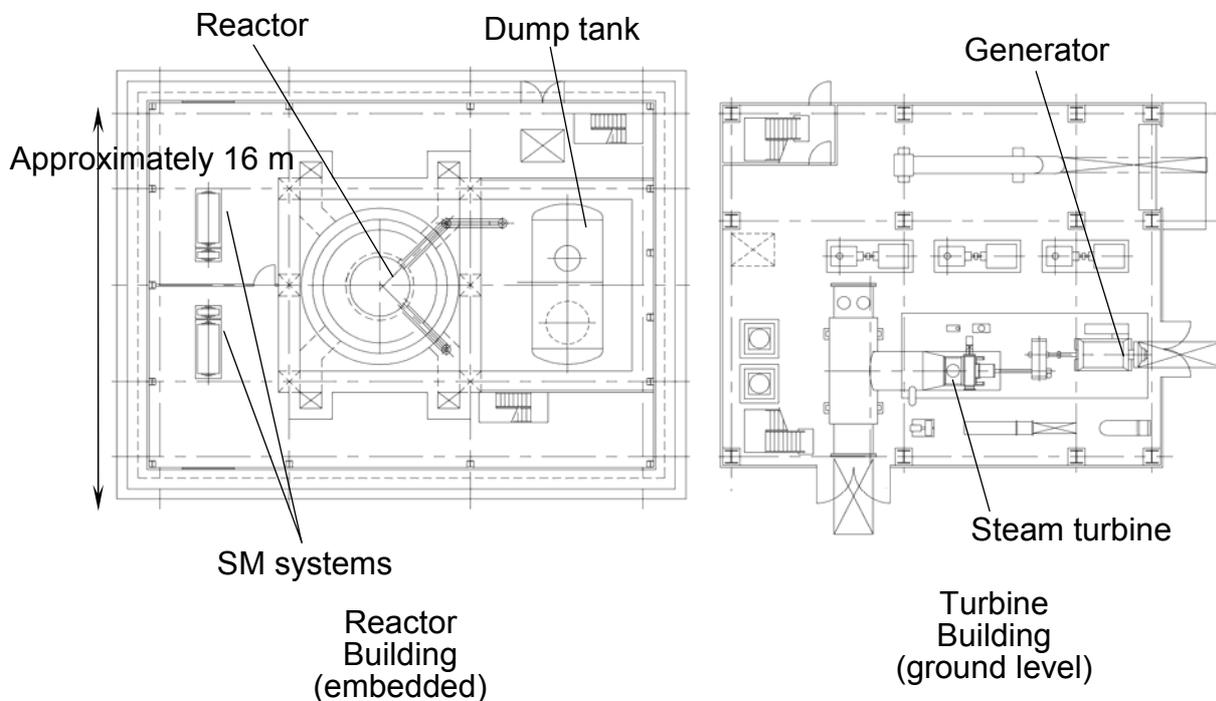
Horizontal cross-section of the 4S plant of 10MW(e).
